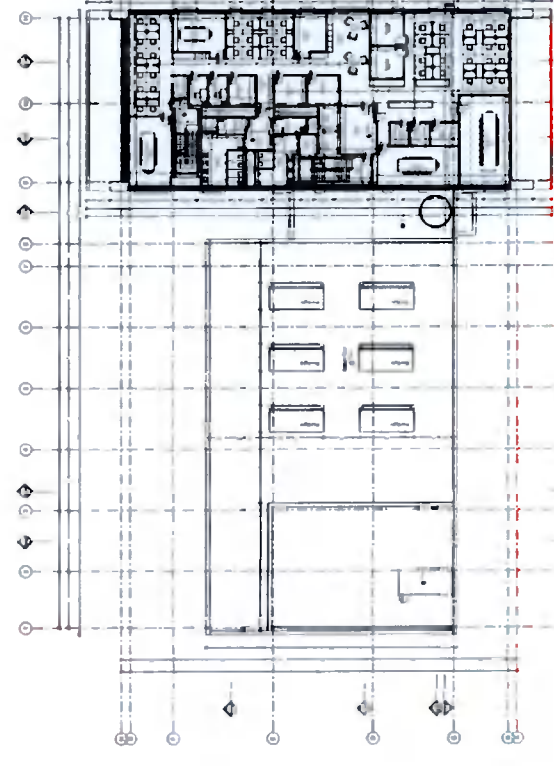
C.A.B. Proposed 1st Floor (& Cafeteria Roof) Plan (image updated)
